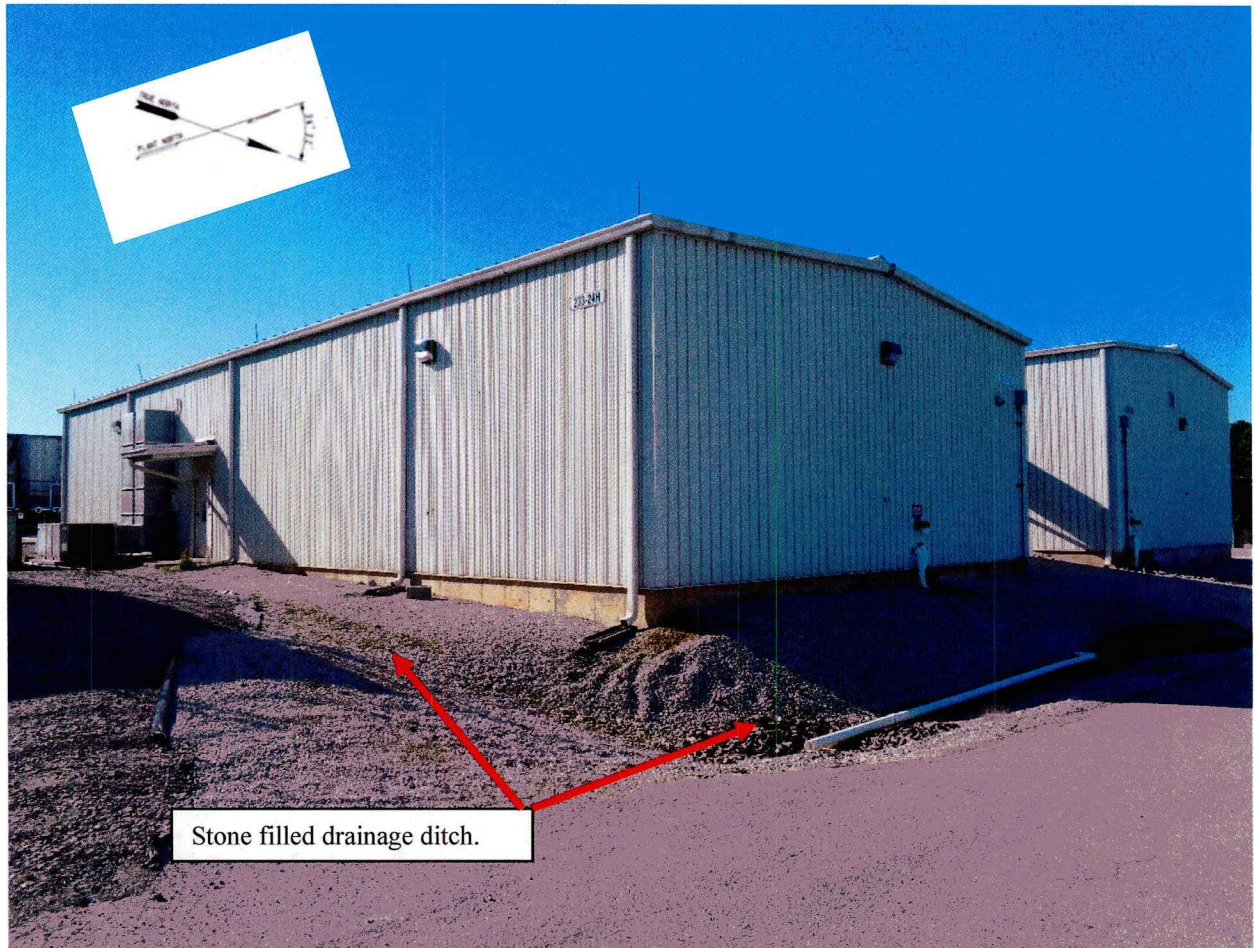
Building 233-24H Looking Northwest (233-23H in background)
